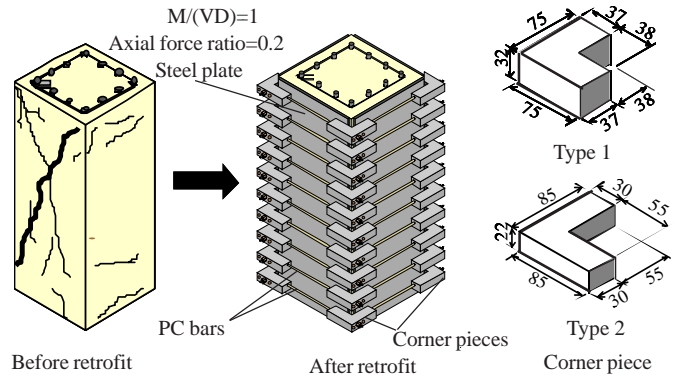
Emergency retrofit for extreme short RC columns by PC bars and steel plates
